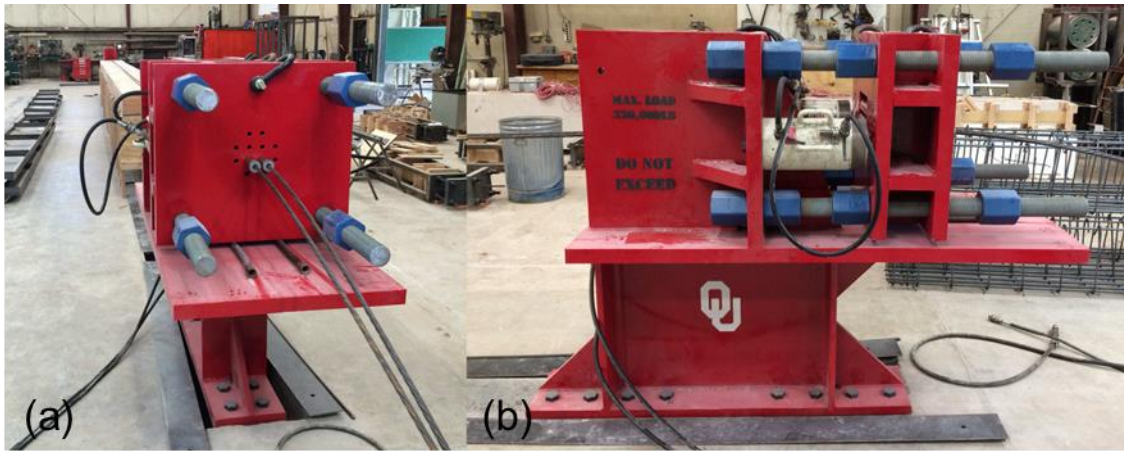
(a) View along prestressing bed, and (b) live end prestressing abutment
